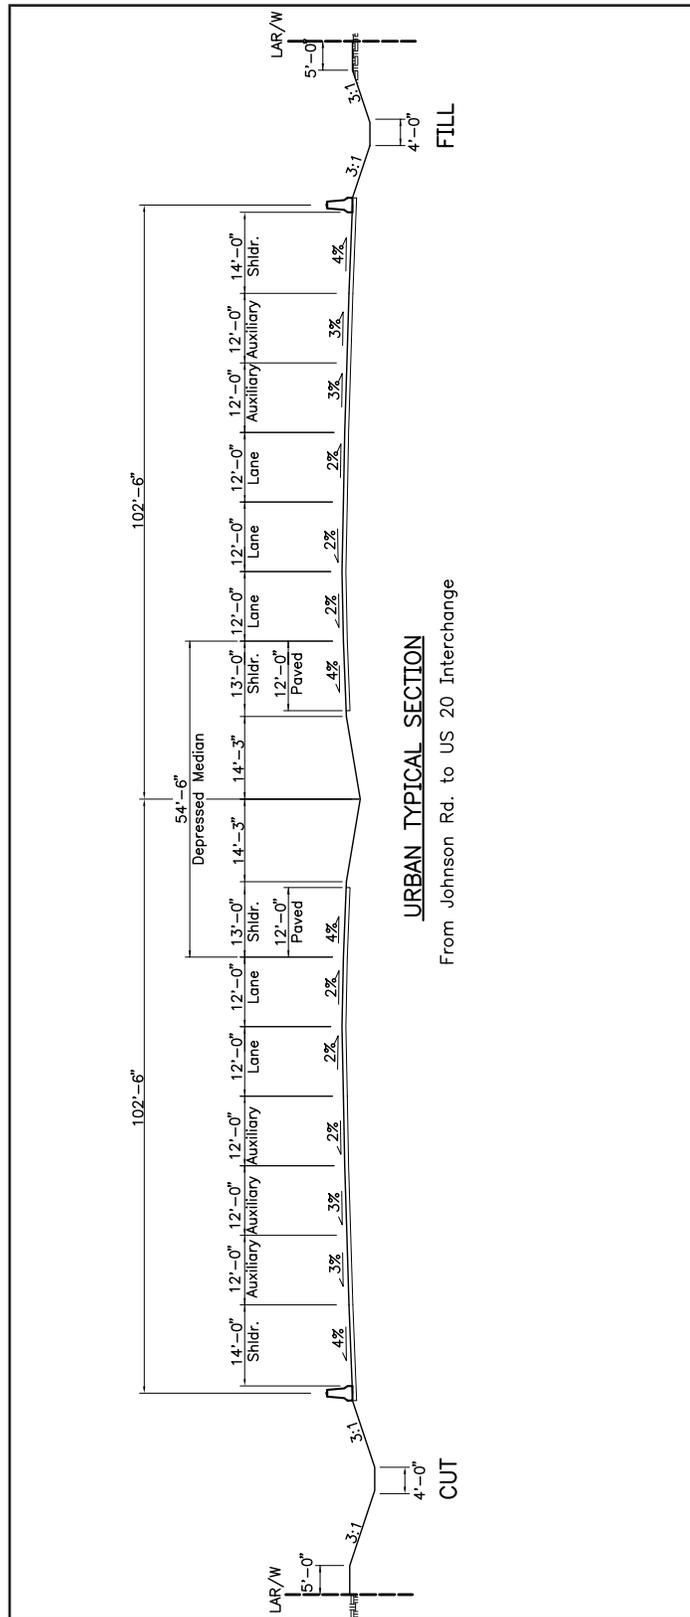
Urban Typical Section (From Johnson Road to the US 20 Interchange)
